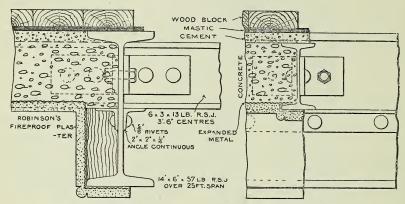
Concrete Steel Floor Loaded Unequally.
